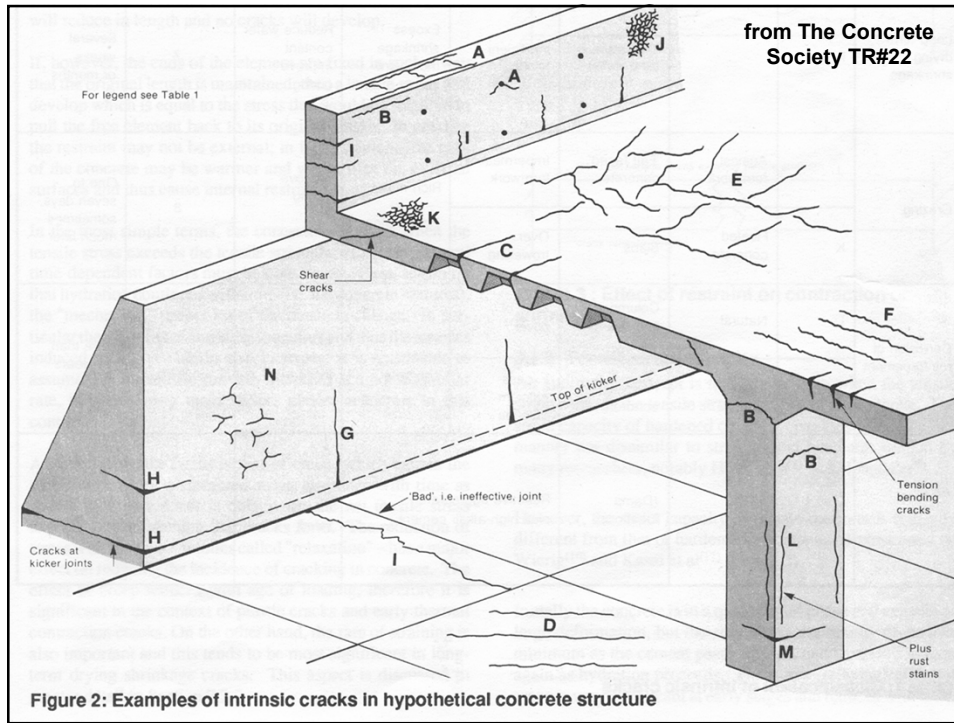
Examples of intrinsic cracks in hypothetical concrete structure
